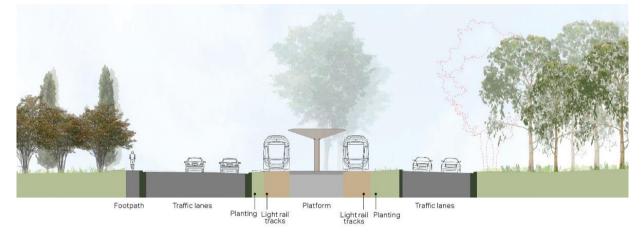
Indicative cross section of a median running arrangement, with an island platform (in the Parliament House precinct at the Sydney Avenue Stop)
